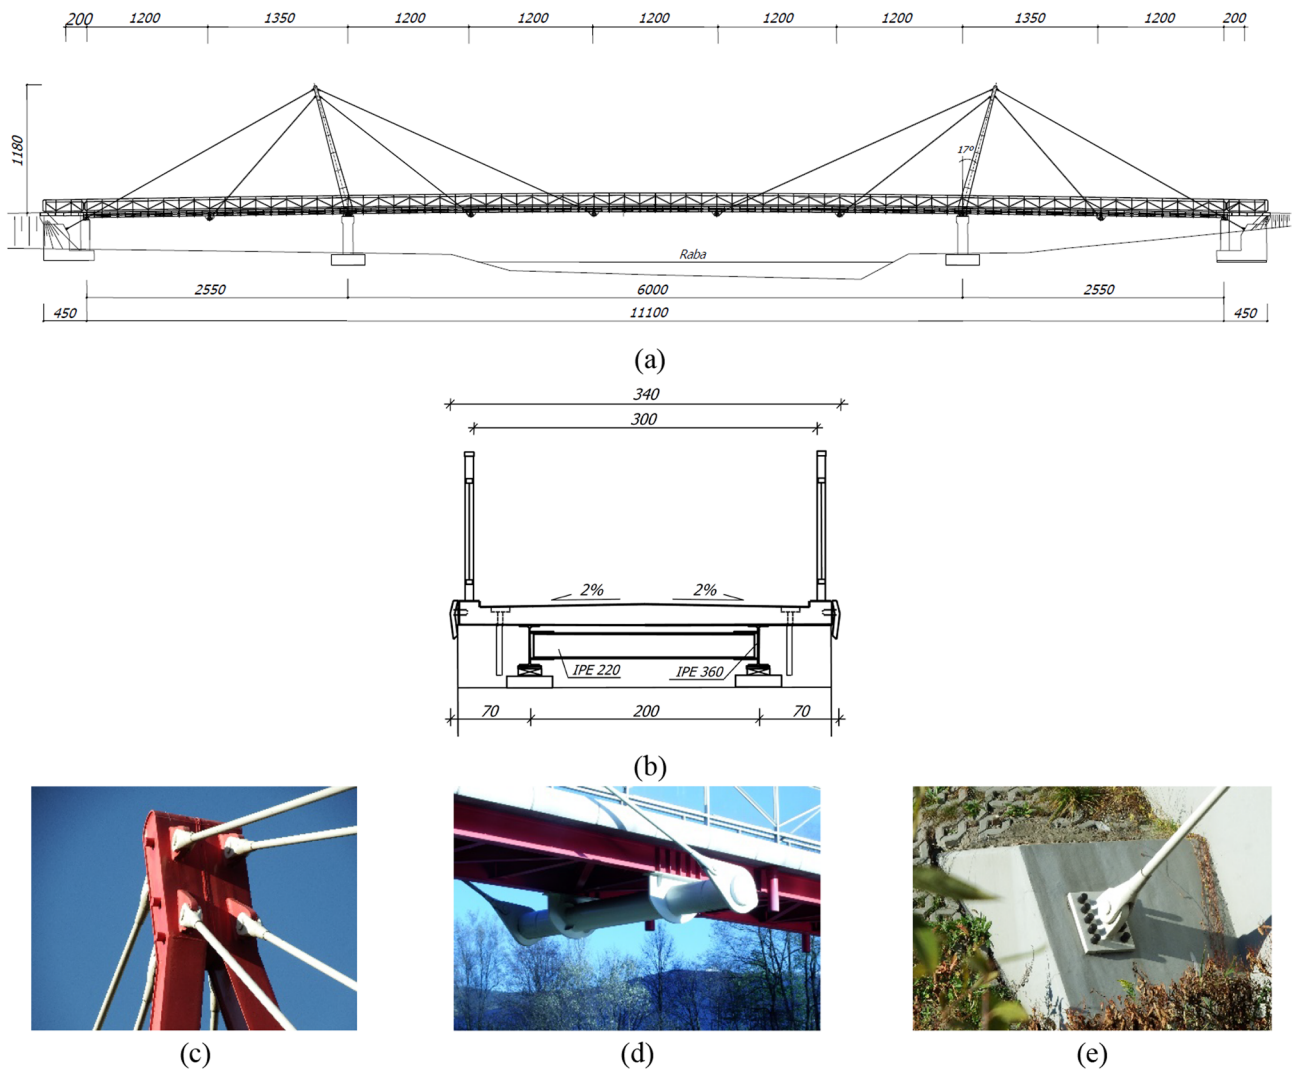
Side view (a) and cross section (b) of the cable-stayed footbridge—dimensions in [mm]. Connections of cables with the structural elements of the footbridge (c), (d), (e)
